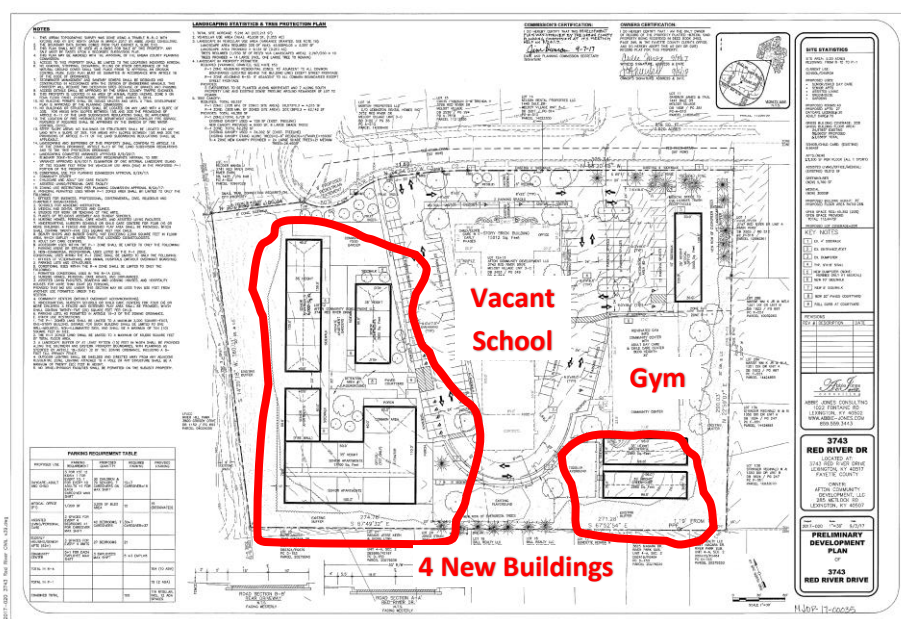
Previous 2017 R-4 Rezoning Design Plan
